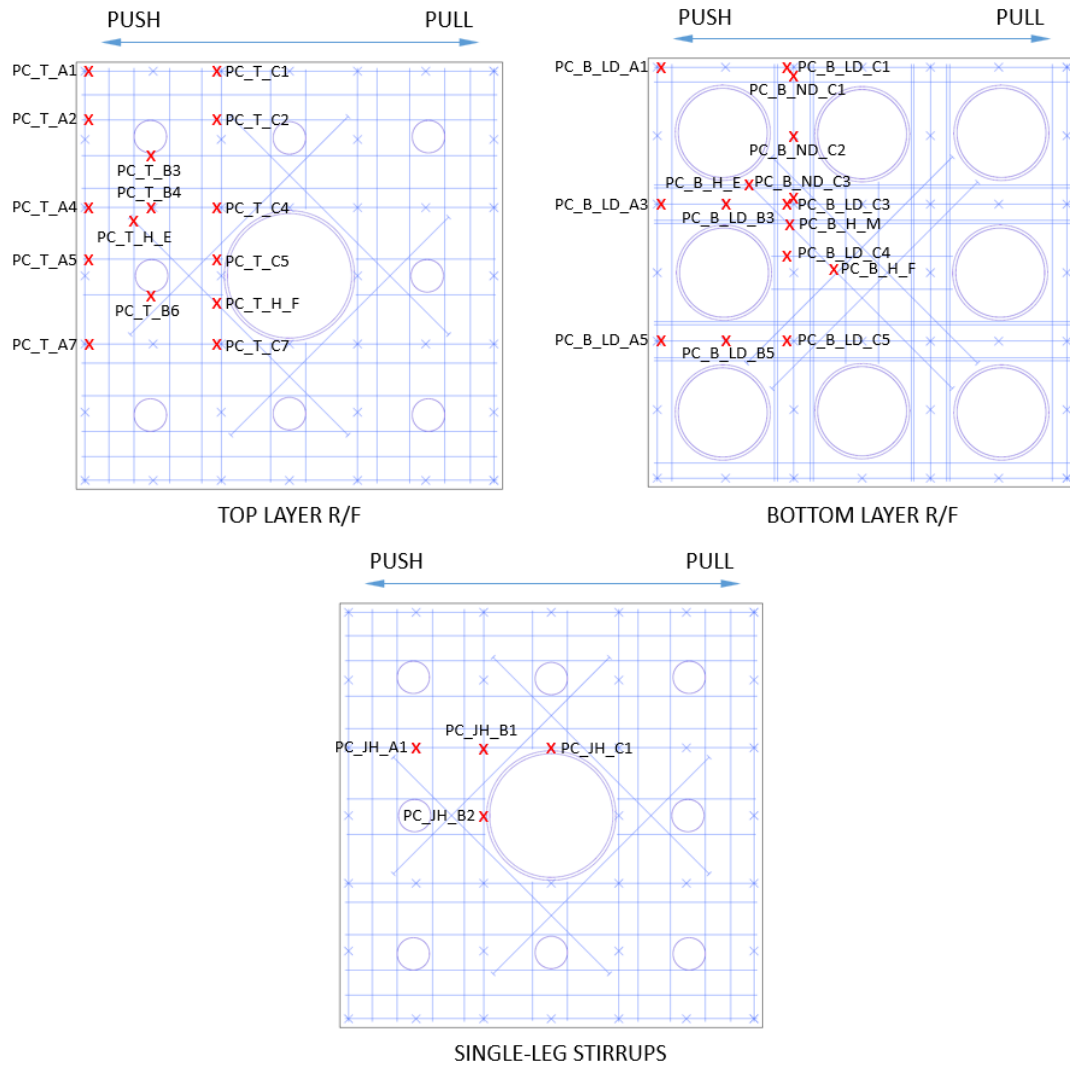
through Figure 5.35 show the plan view of the strain gauges in the precast column and the precast pile cap.
